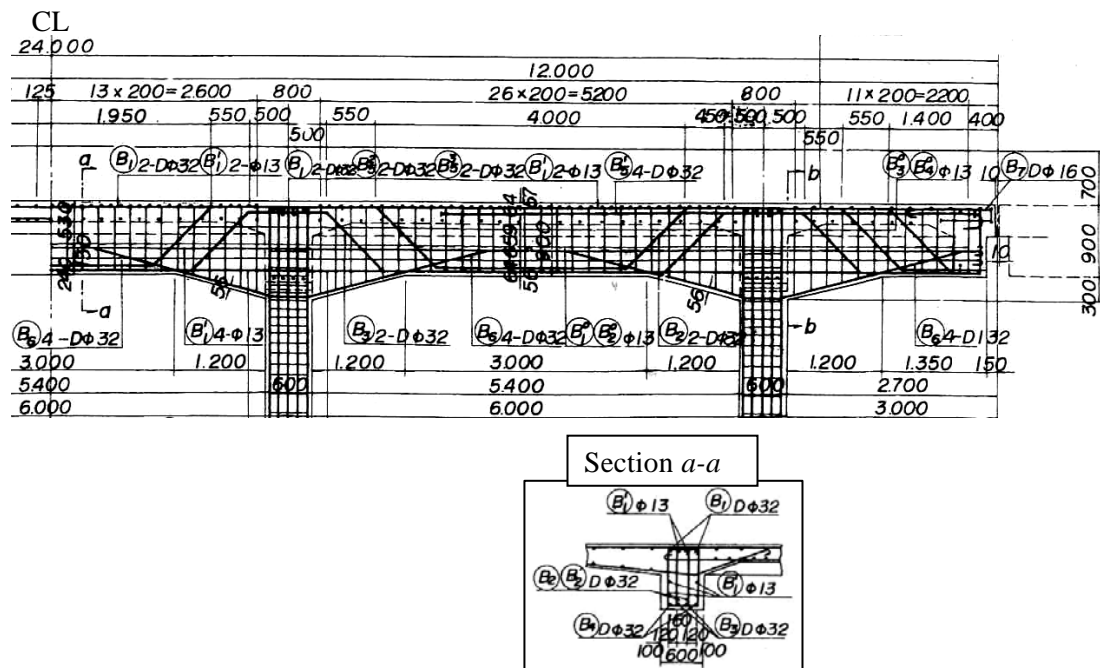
Reinforced bar arrangement of longitudinal beams
